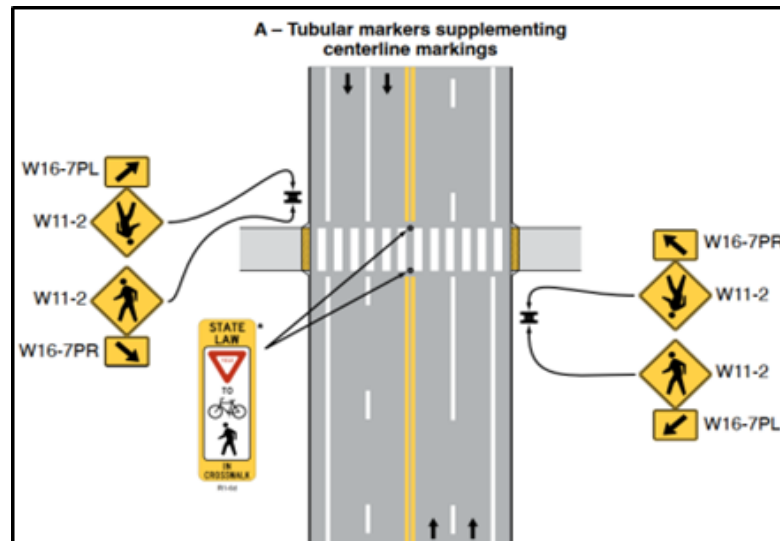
Recommended pavement markings and crossing warning signs, from the MUTCD.
